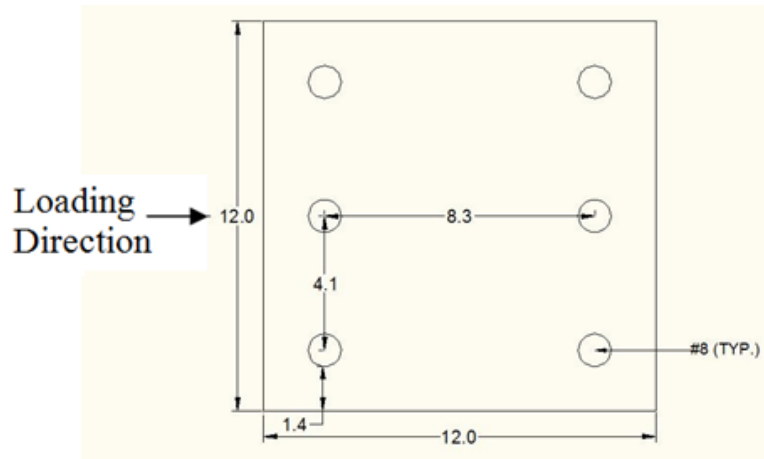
Cross-Section of SCSFC Column (dimensions in inches)
